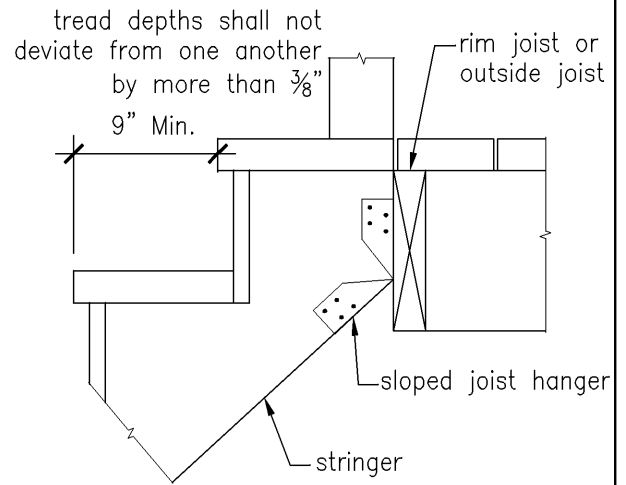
STAIRWAY CONNECTION TO DECK DETAILS
